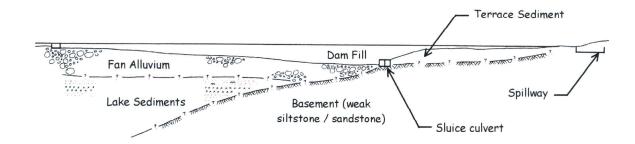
Geological Long Section Through the Dam Foundation (viewed from downstream)
